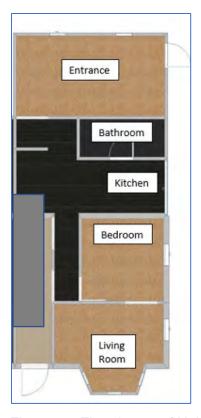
Floor layout of Unit 3 (not to scale). Note the grey area is associated with Unit 2
